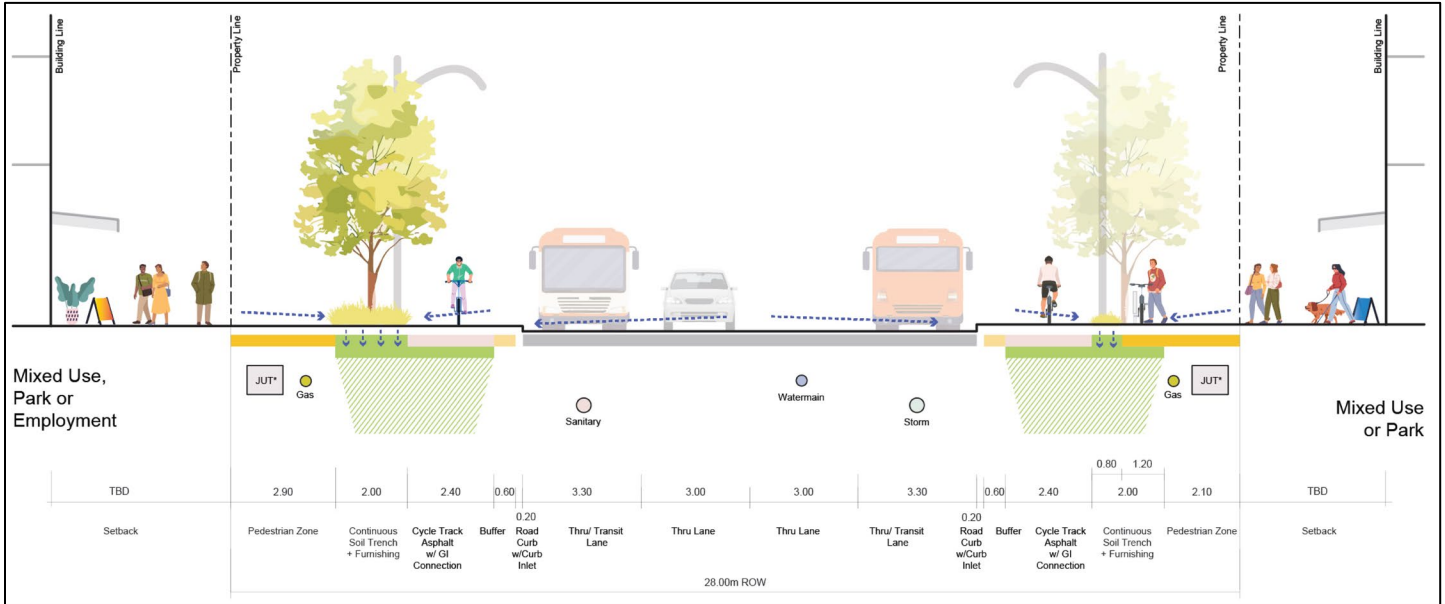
Dufferin Street (Northern Street to Sheppard Avenue West) Cross-Section - Option 2
